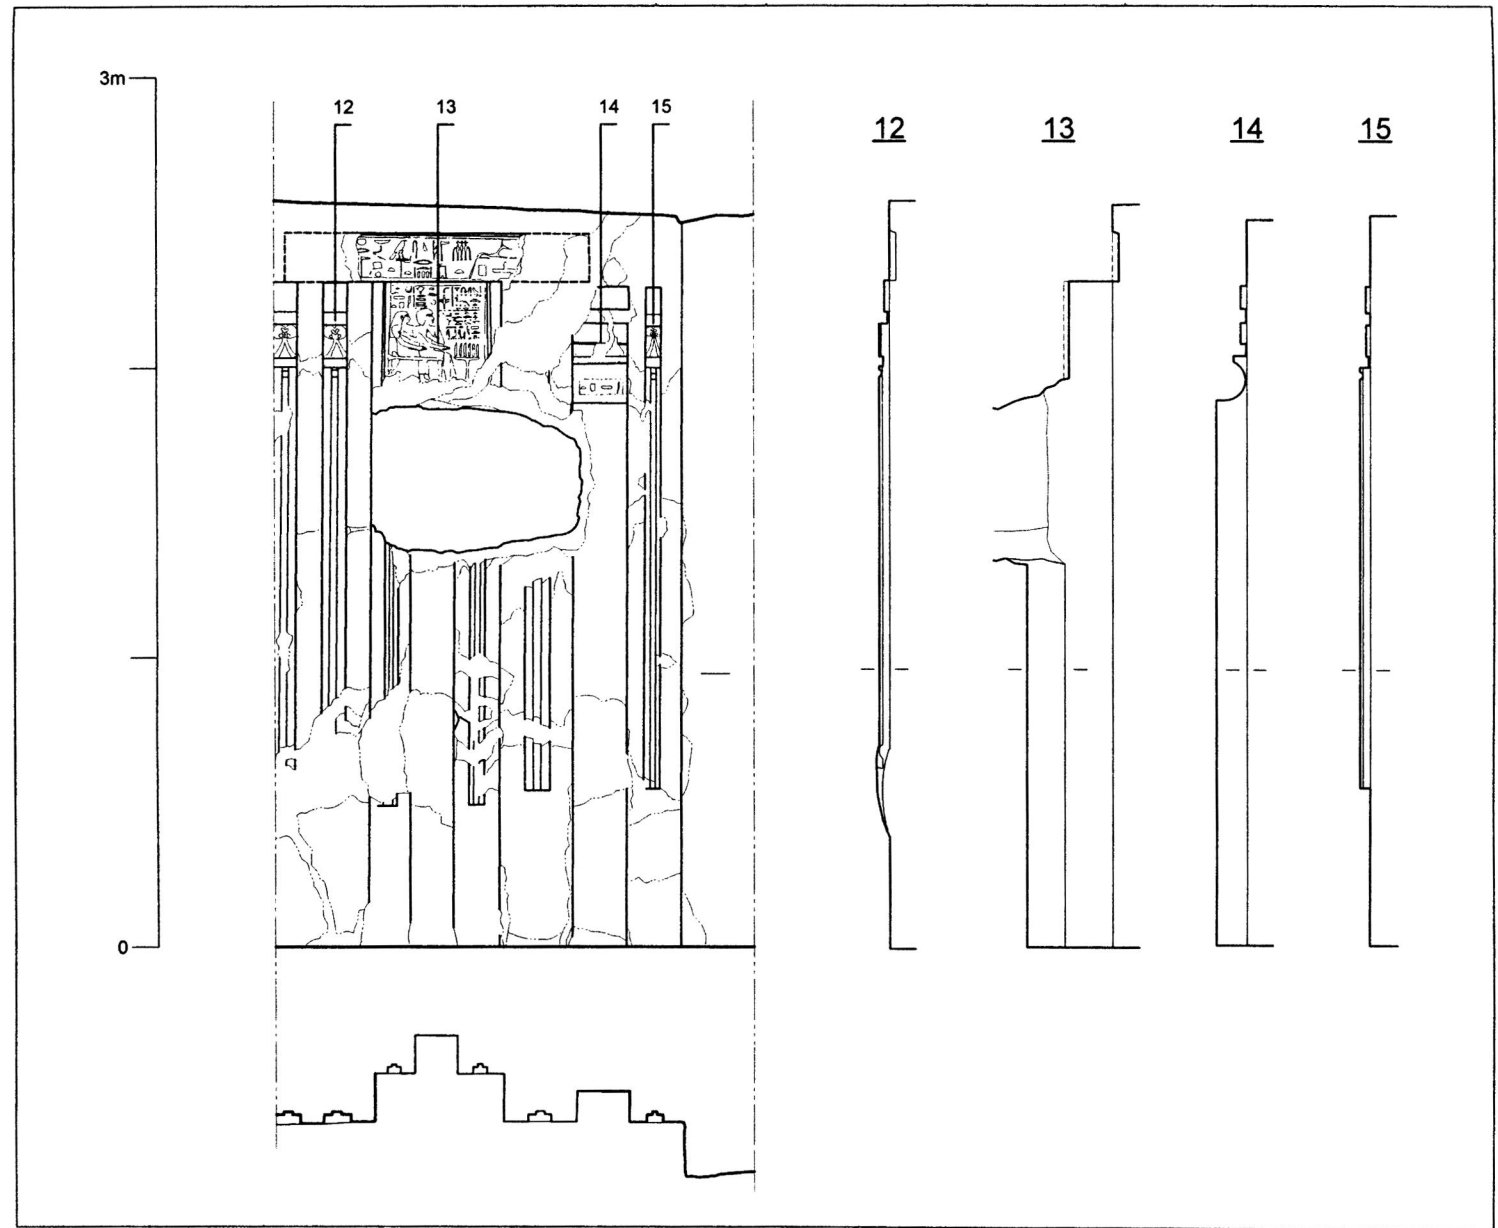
Tomb of Khafraankh. Western wall, right part, sections and plan
